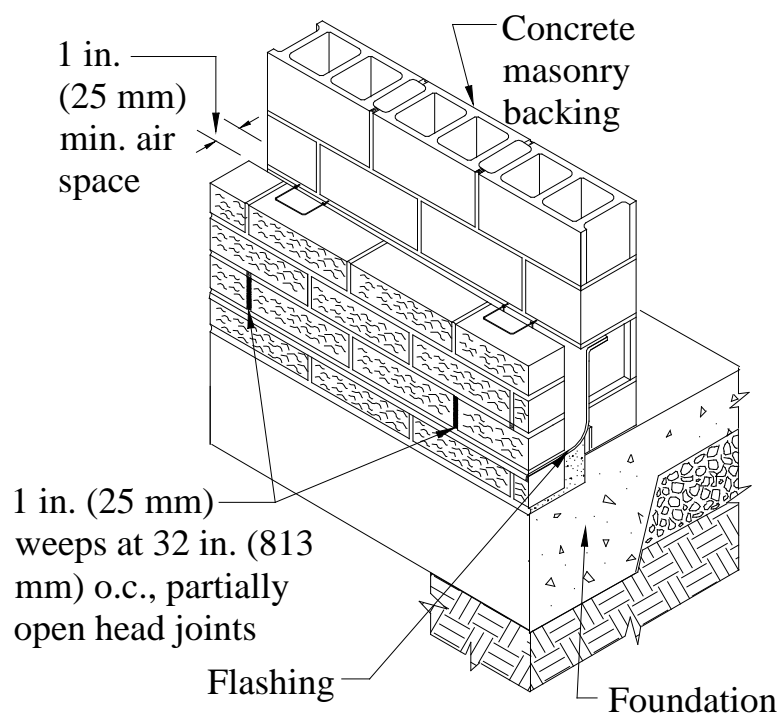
Typical Brick Veneer Cavity Wall Geometry (Insulation not Shown)
